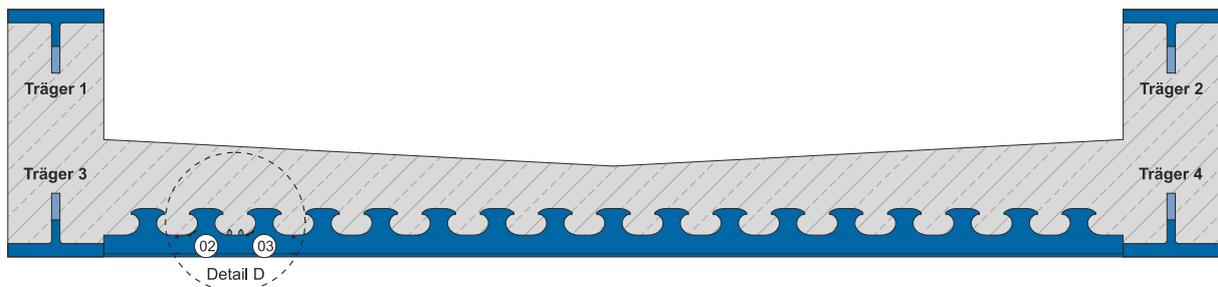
Cross section VFT-Rail with composite dowels and composite slab
